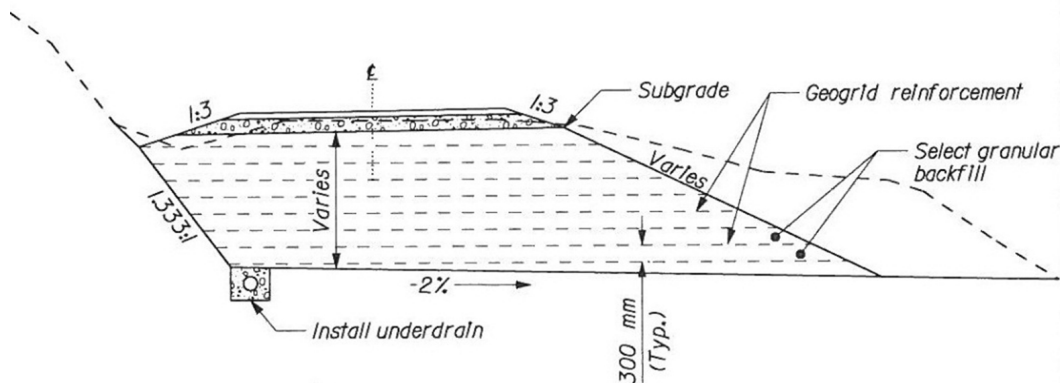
Typical geogrid reinforced section at Gifford Pinchot, Road 26.
